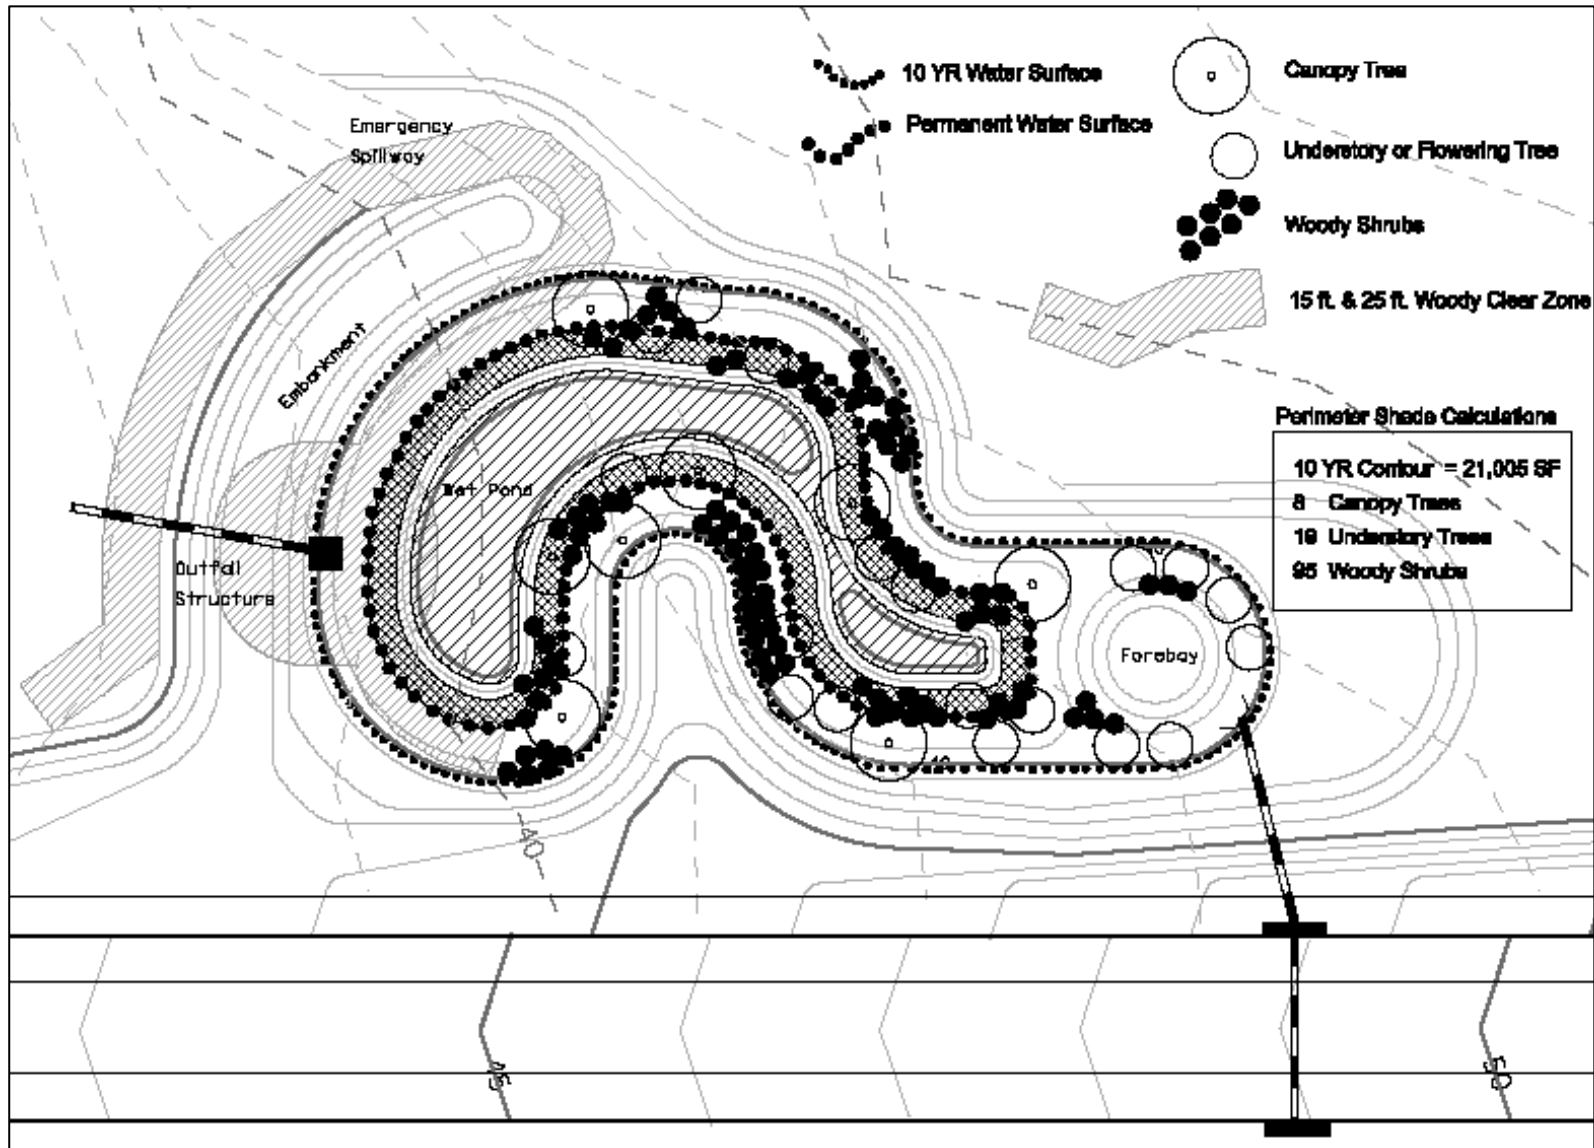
D – Stormwater Pond Planting Plan Based on Minimum Planting Requirements
